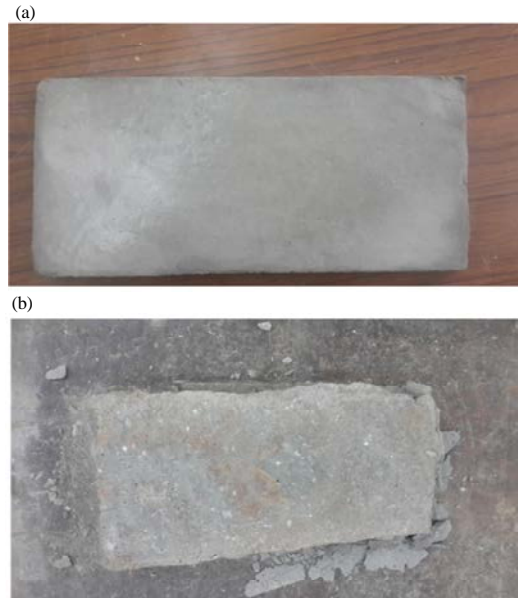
Cementitious brick specimen: a) Before failure and b) After failure
